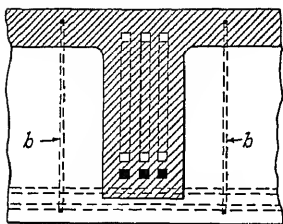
Details of Reinforcement at Junction of Beam and Girder
